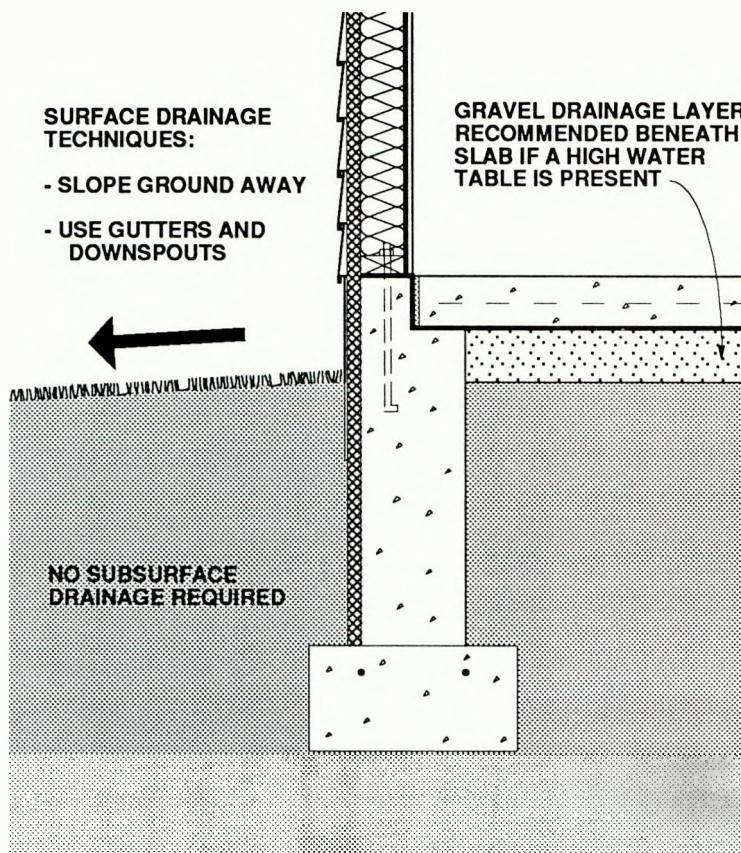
Drainage Techniques for Slab-on-Grade Foundations
